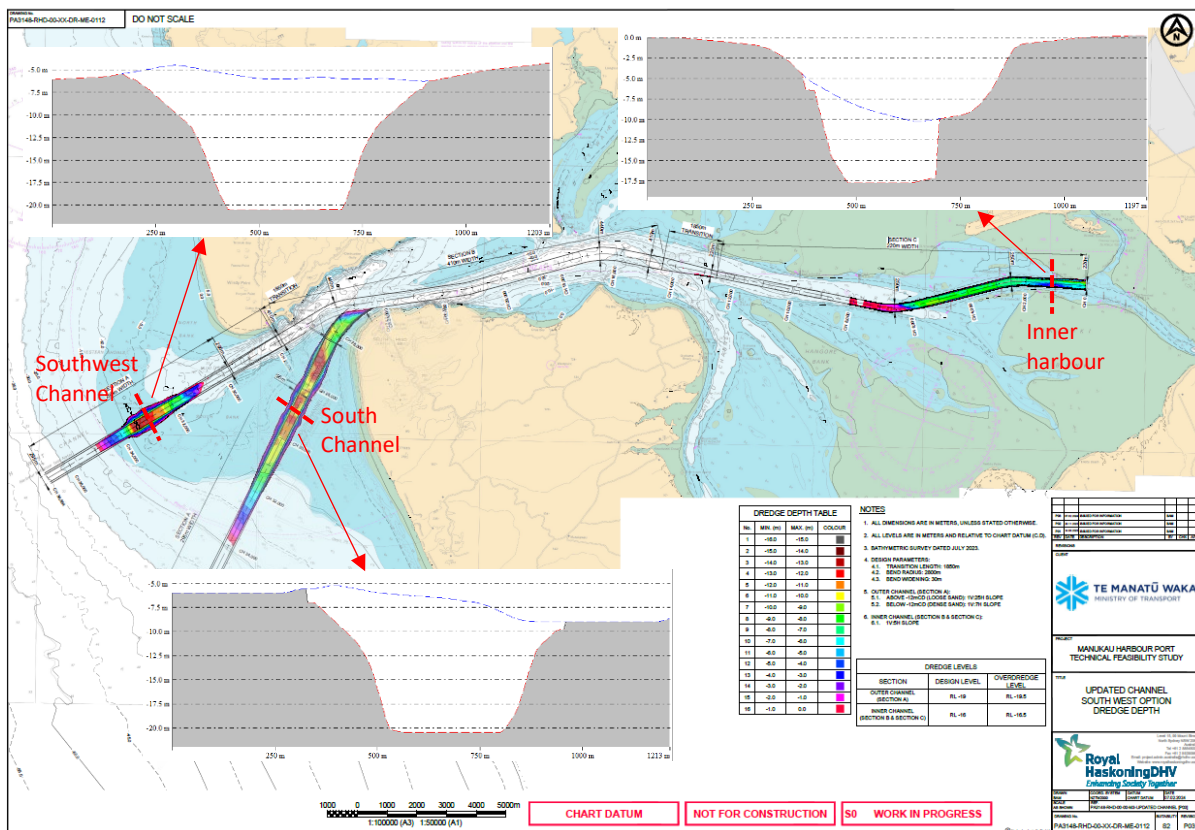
Concept Design for South-West and South Channel options including plan and cross-sections (source: TWP04)
